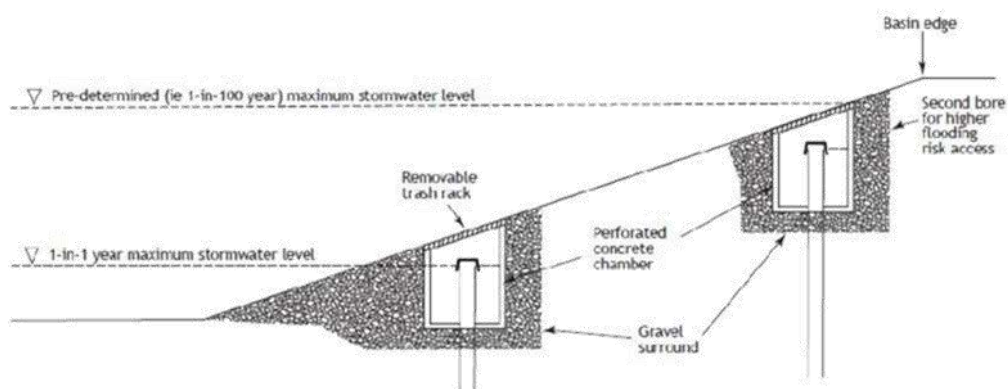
Retention Basin Typical Section (EPA, 2007)
